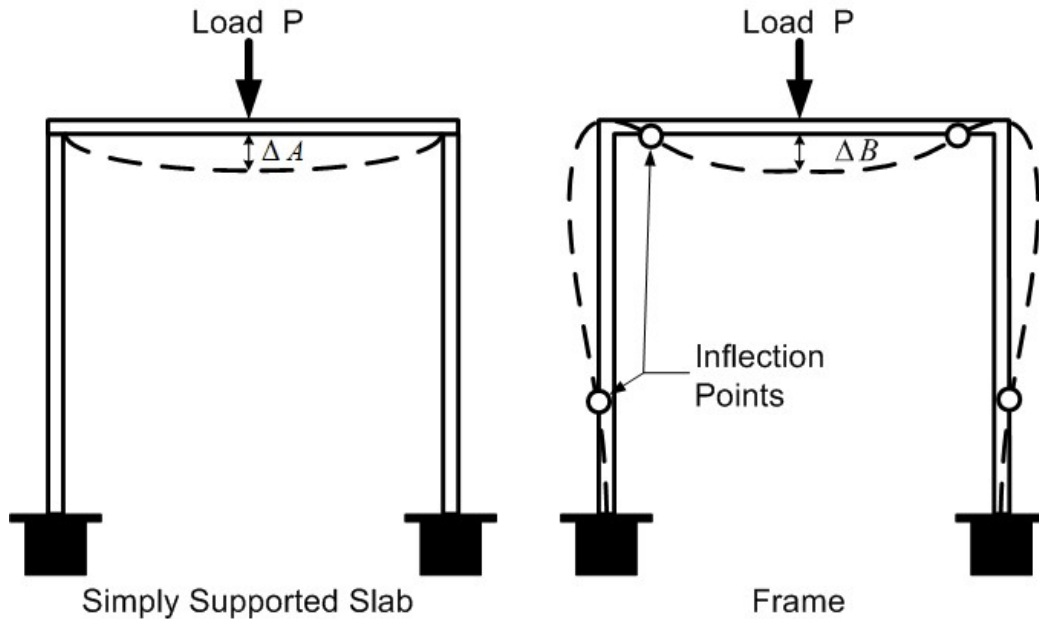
Deflected Simply Supported Slab versus Deflected Frame Shape
